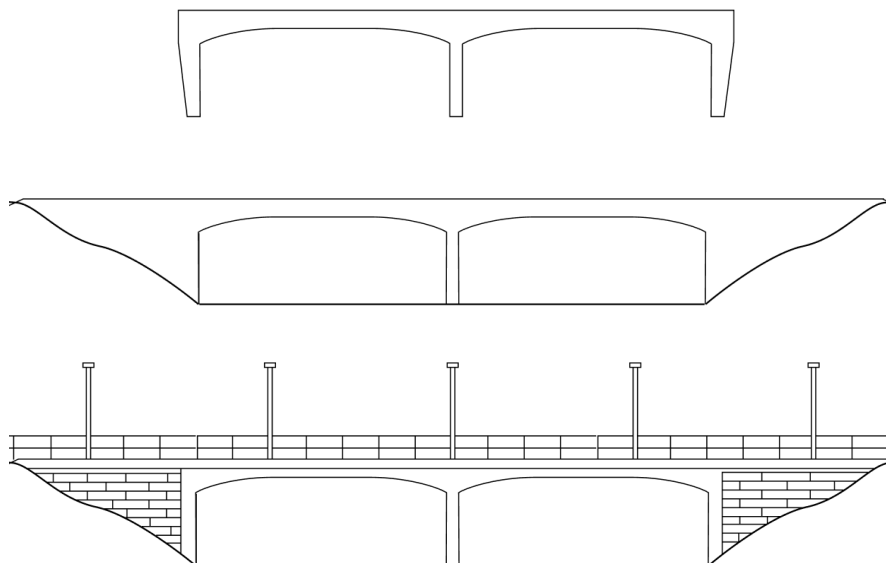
Comparison between a bridge configuration showing the primary structural form used for structural analysis (top), the same bridge including abutment walls (middle), and the bridge with additional detailing elements such as railings, brick-designed abutments, and street lighting (bottom).
